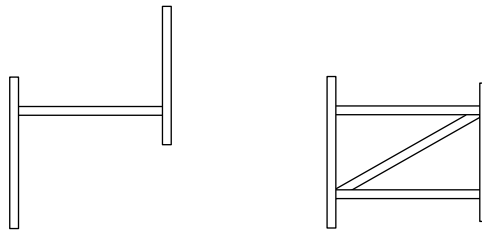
Configuration of Frame for Type 'C' Tower.
